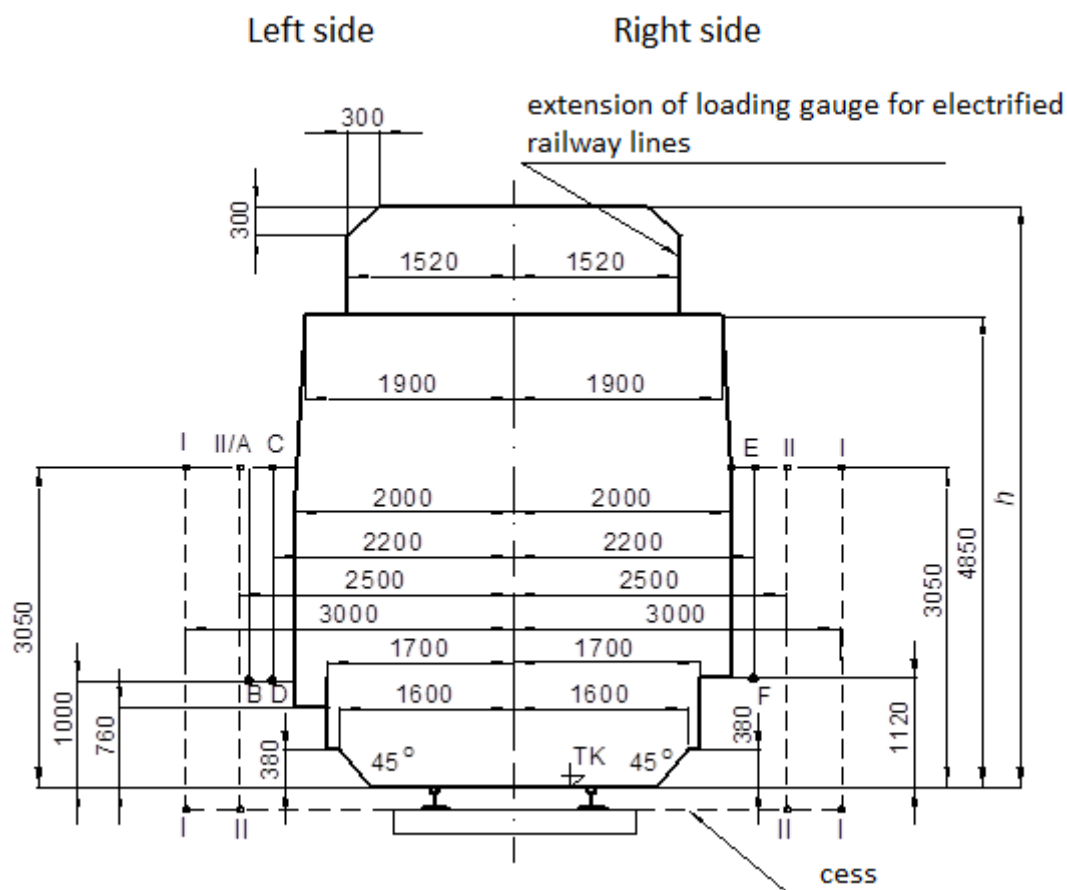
Outline of the Z-GC cross-section and free walking and handling space (applies to straight railway and arc radius $R \cdot 250$ m)
